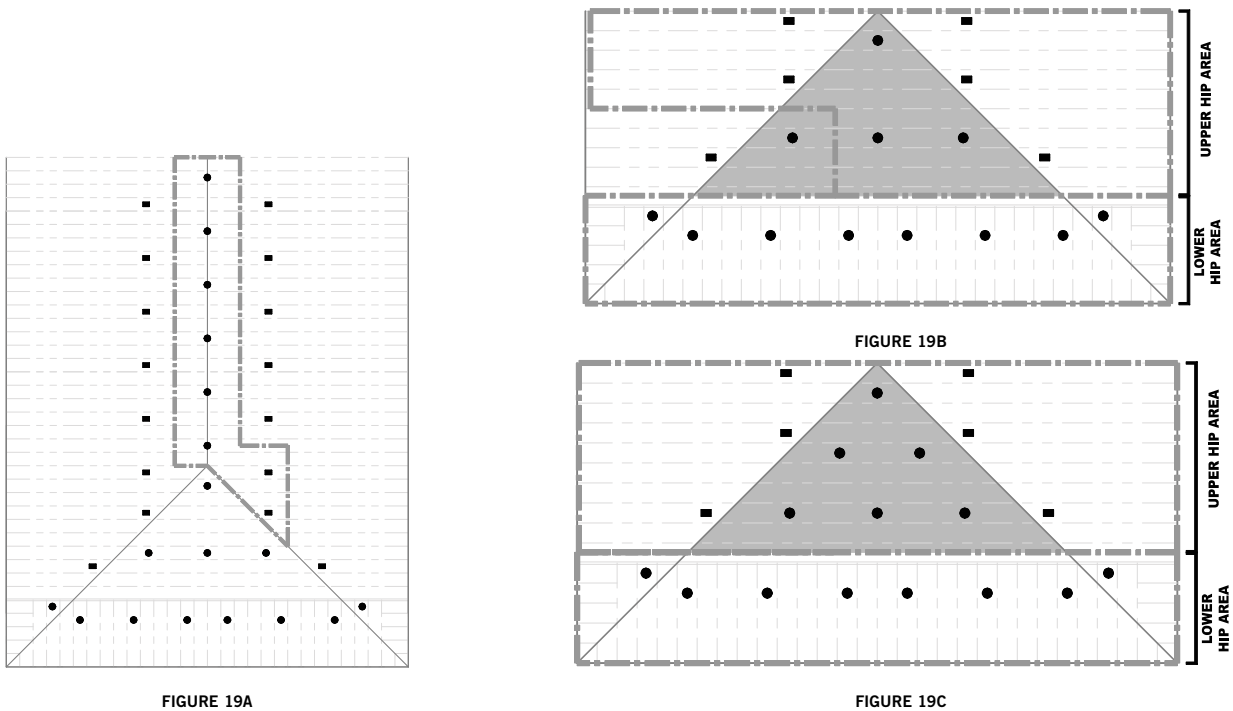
HYDRAULIC CALCULATIONS REQUIRED FOR HIP - DRY SYSTEM (HIP TRUSS/JACK TRUSS CONSTRUCTION)
